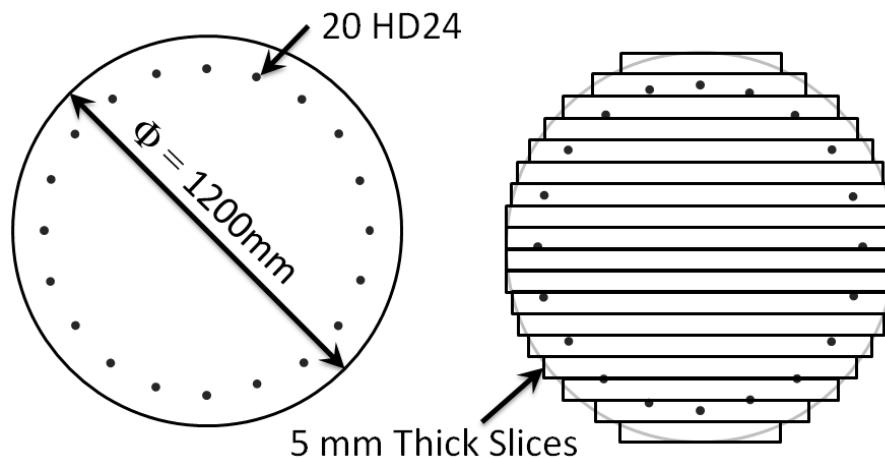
Left: Section layout for the piers of New Brighton Pier, Right: Model representation of the section using 5mm slices (not to scale)
